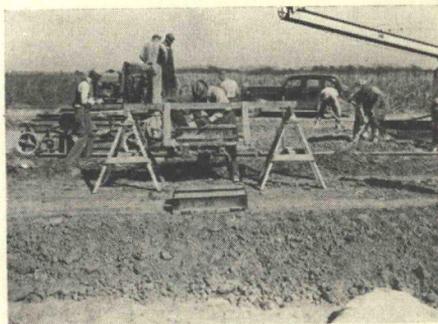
Apparatus for Vibrating Beam and Cylinder Test Specimens
